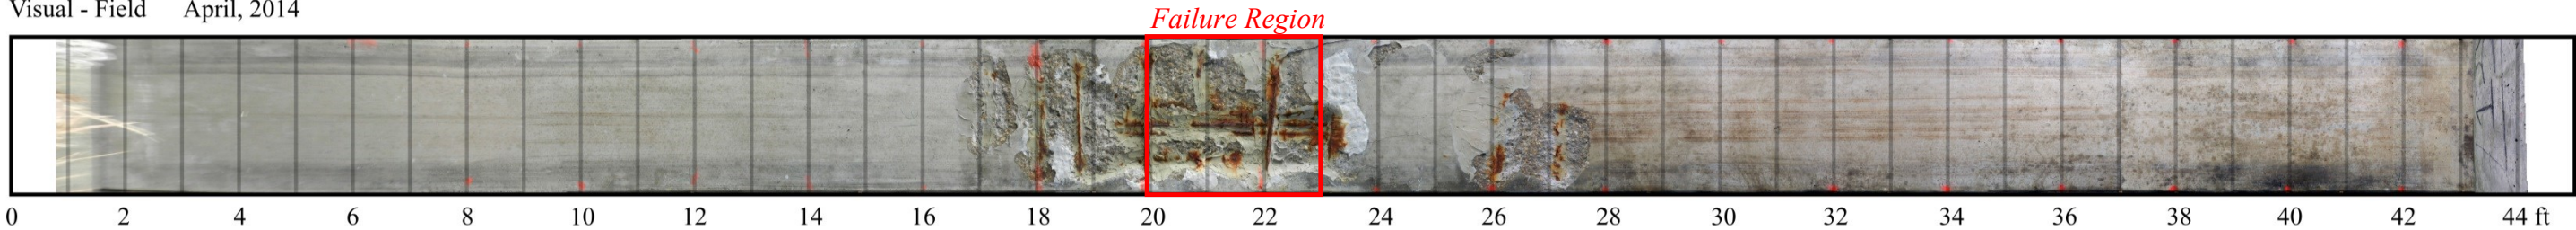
Oyster Creek - Span 1 - Slab 13, slab soffit after failure
